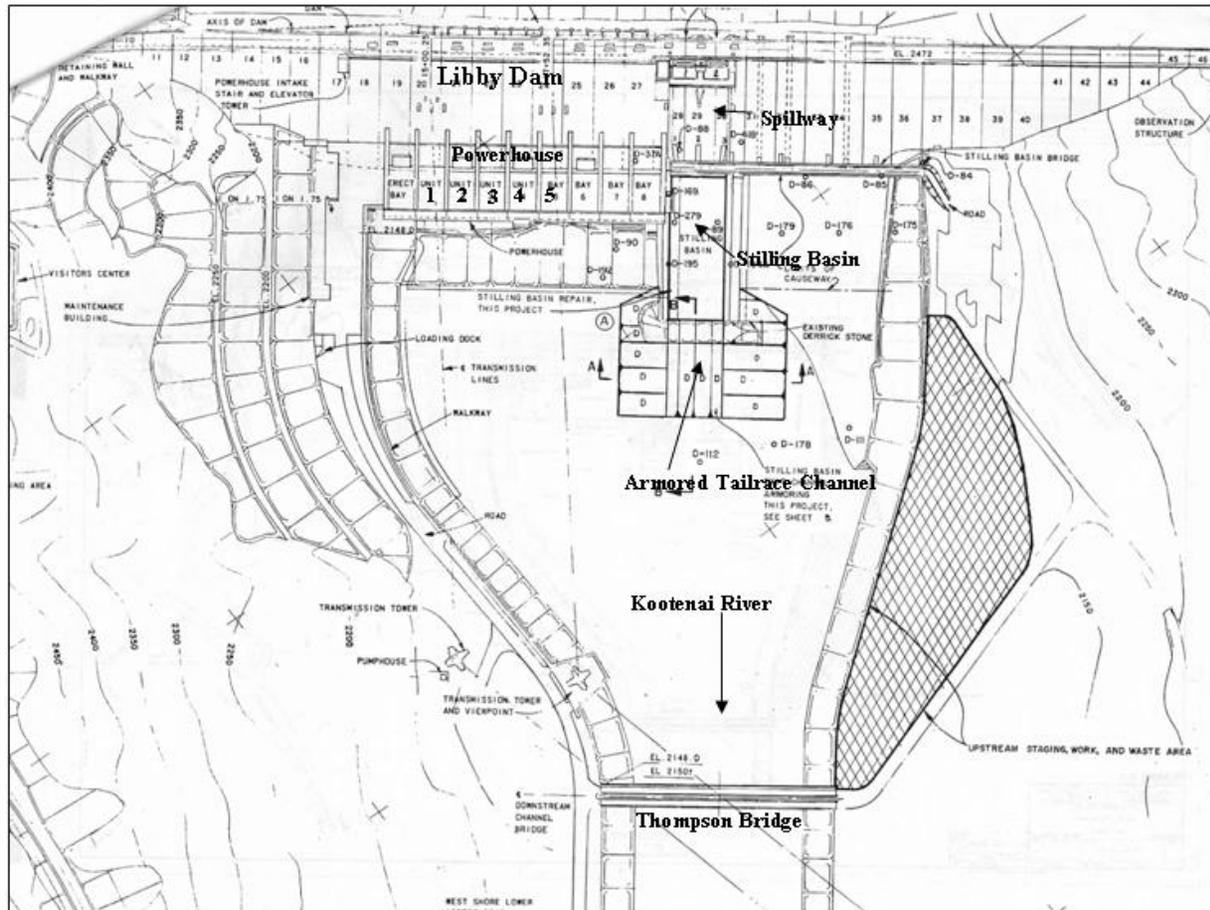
Libby Dam powerhouse, spillway, and stilling basin layout.
